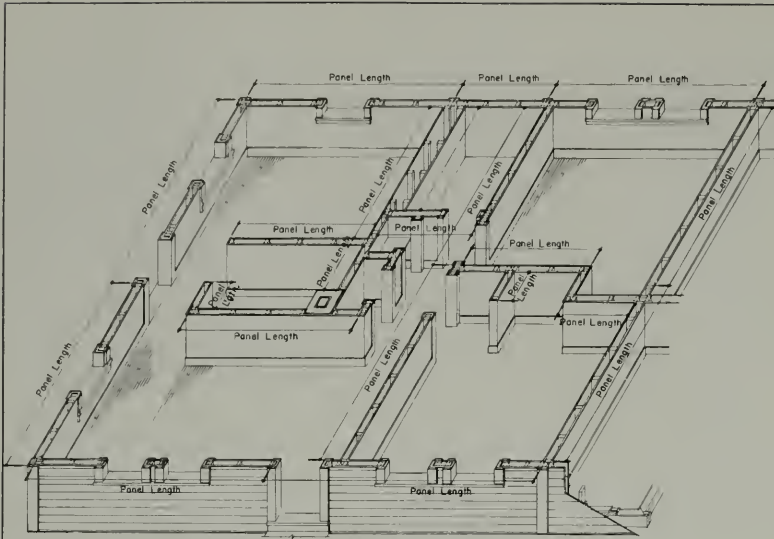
DETAILS FOR MODULAR LAYOUT OF FIELD FABRICATION BY JIG ASSEMBLY
